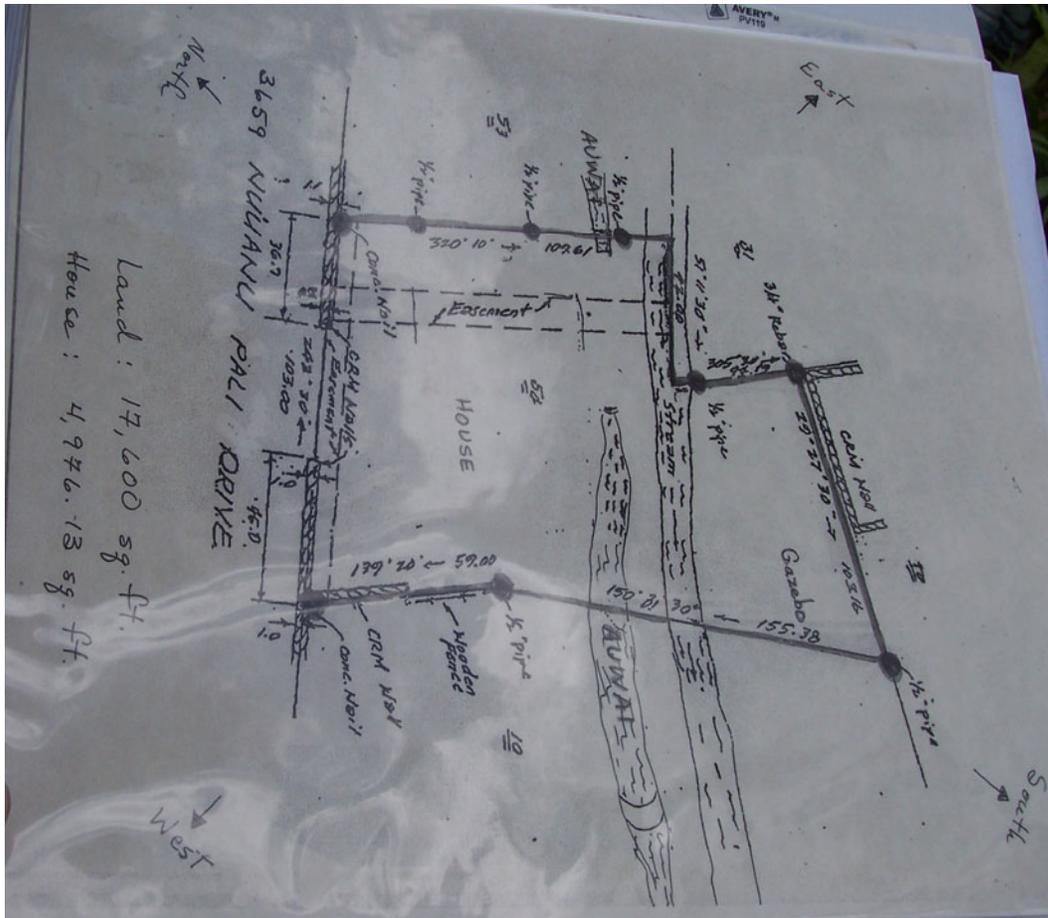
Property Plans illustrating storm drain easement crossing ‘auwai on Sills’ property to Nu‘uanu Stream.
